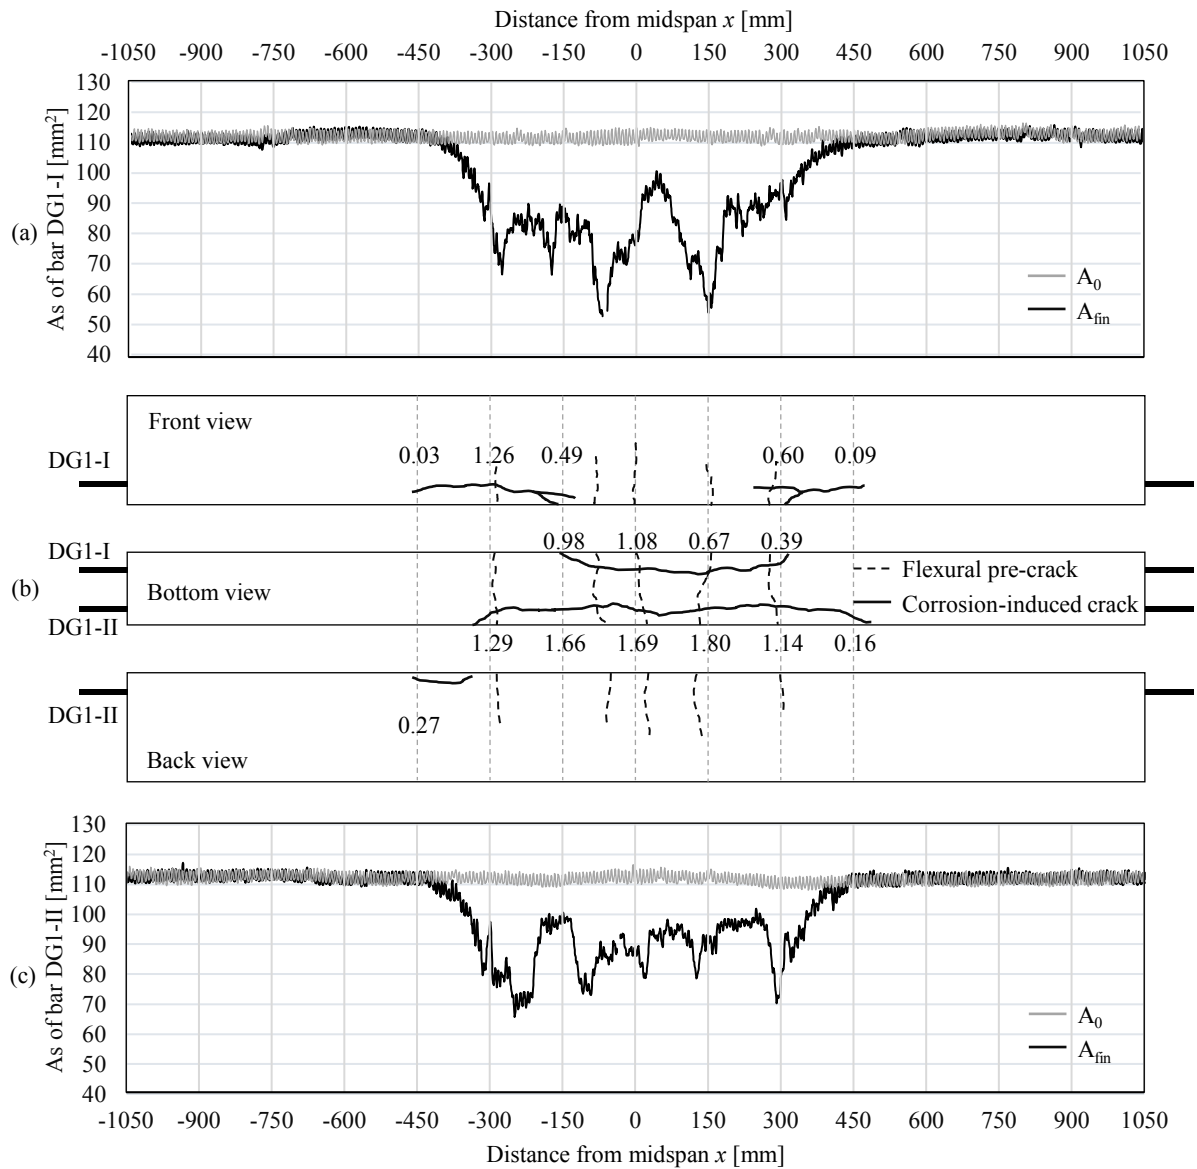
(a, c) Cross-sectional areas of the tensile reinforcement bars I and II in specimen DG1; (b) flexural pre-cracks and corrosion induced cracks, of which the widths (unit in mm) were measured every 150 mm;  $A_s$ —cross-sectional area;  $A_0$ —cross-sectional area of steel bars measured in the initial state before casting beams;  $A_{fin}$ —cross-sectional area of steel bars measured in the final state after taken out from the tested specimens.
